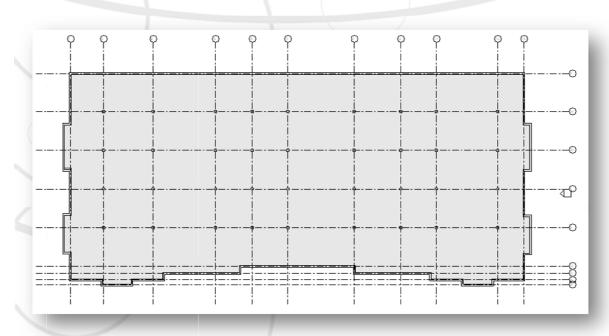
Current Structural System Grid with Structural Steel Column Tubing
